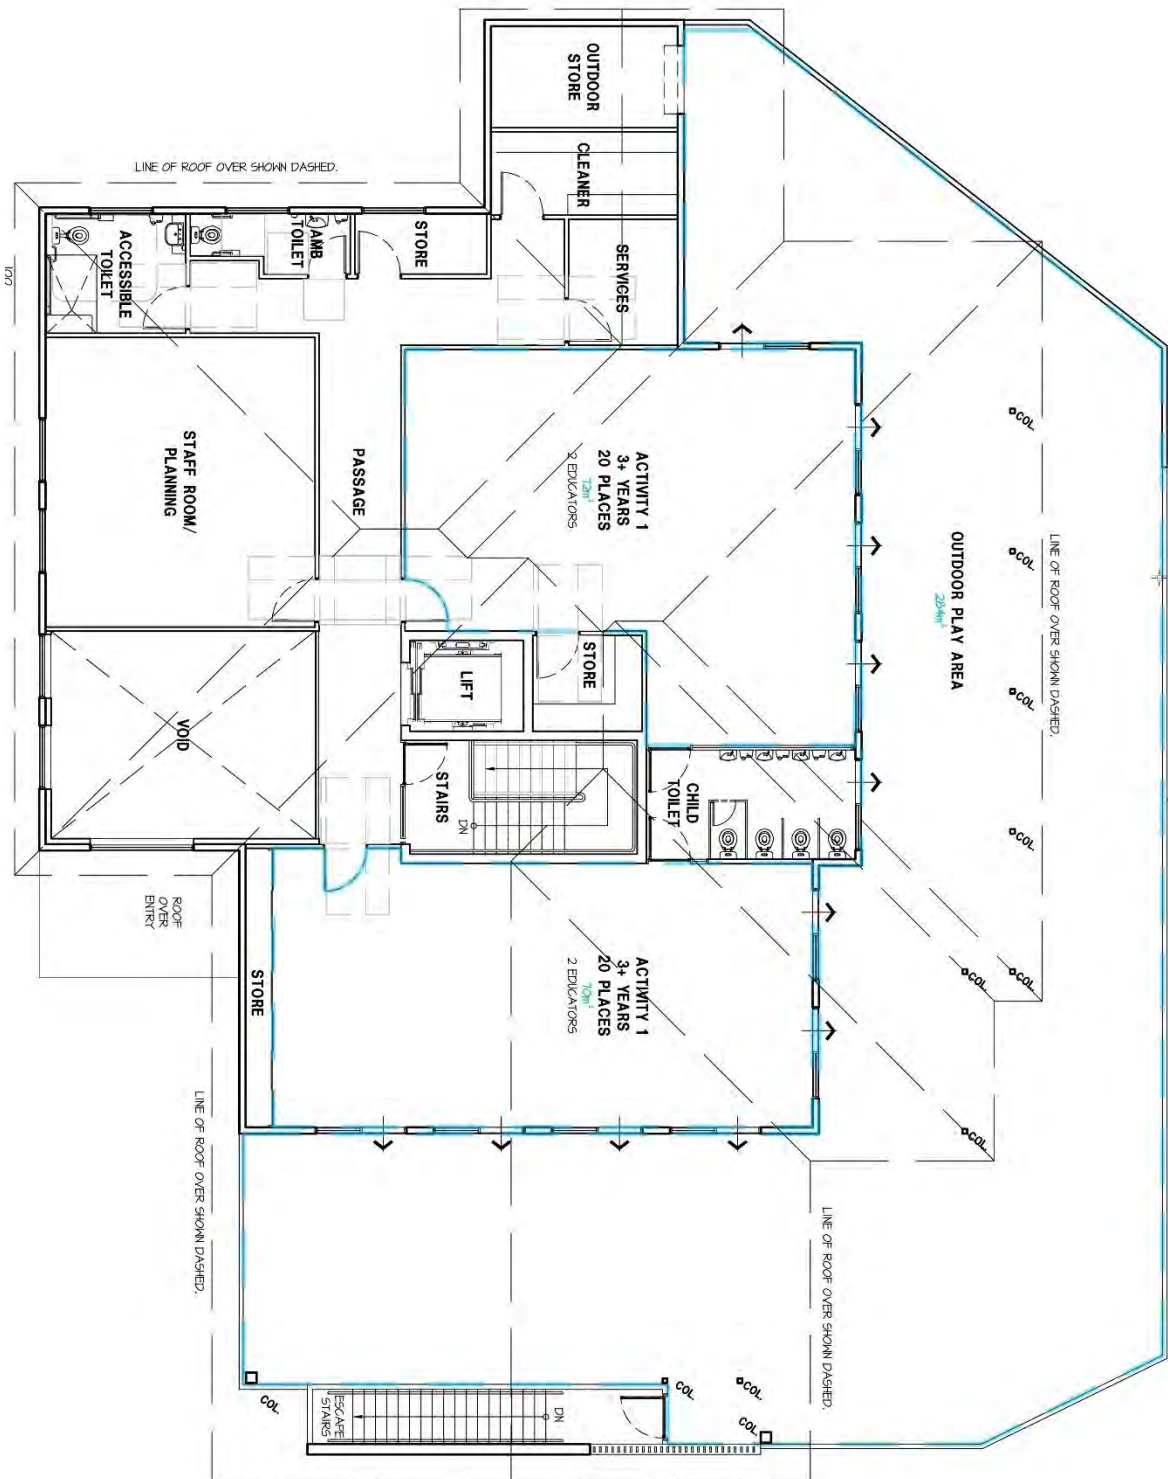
First floor plan for the proposed Shoalwater Childcare Centre
